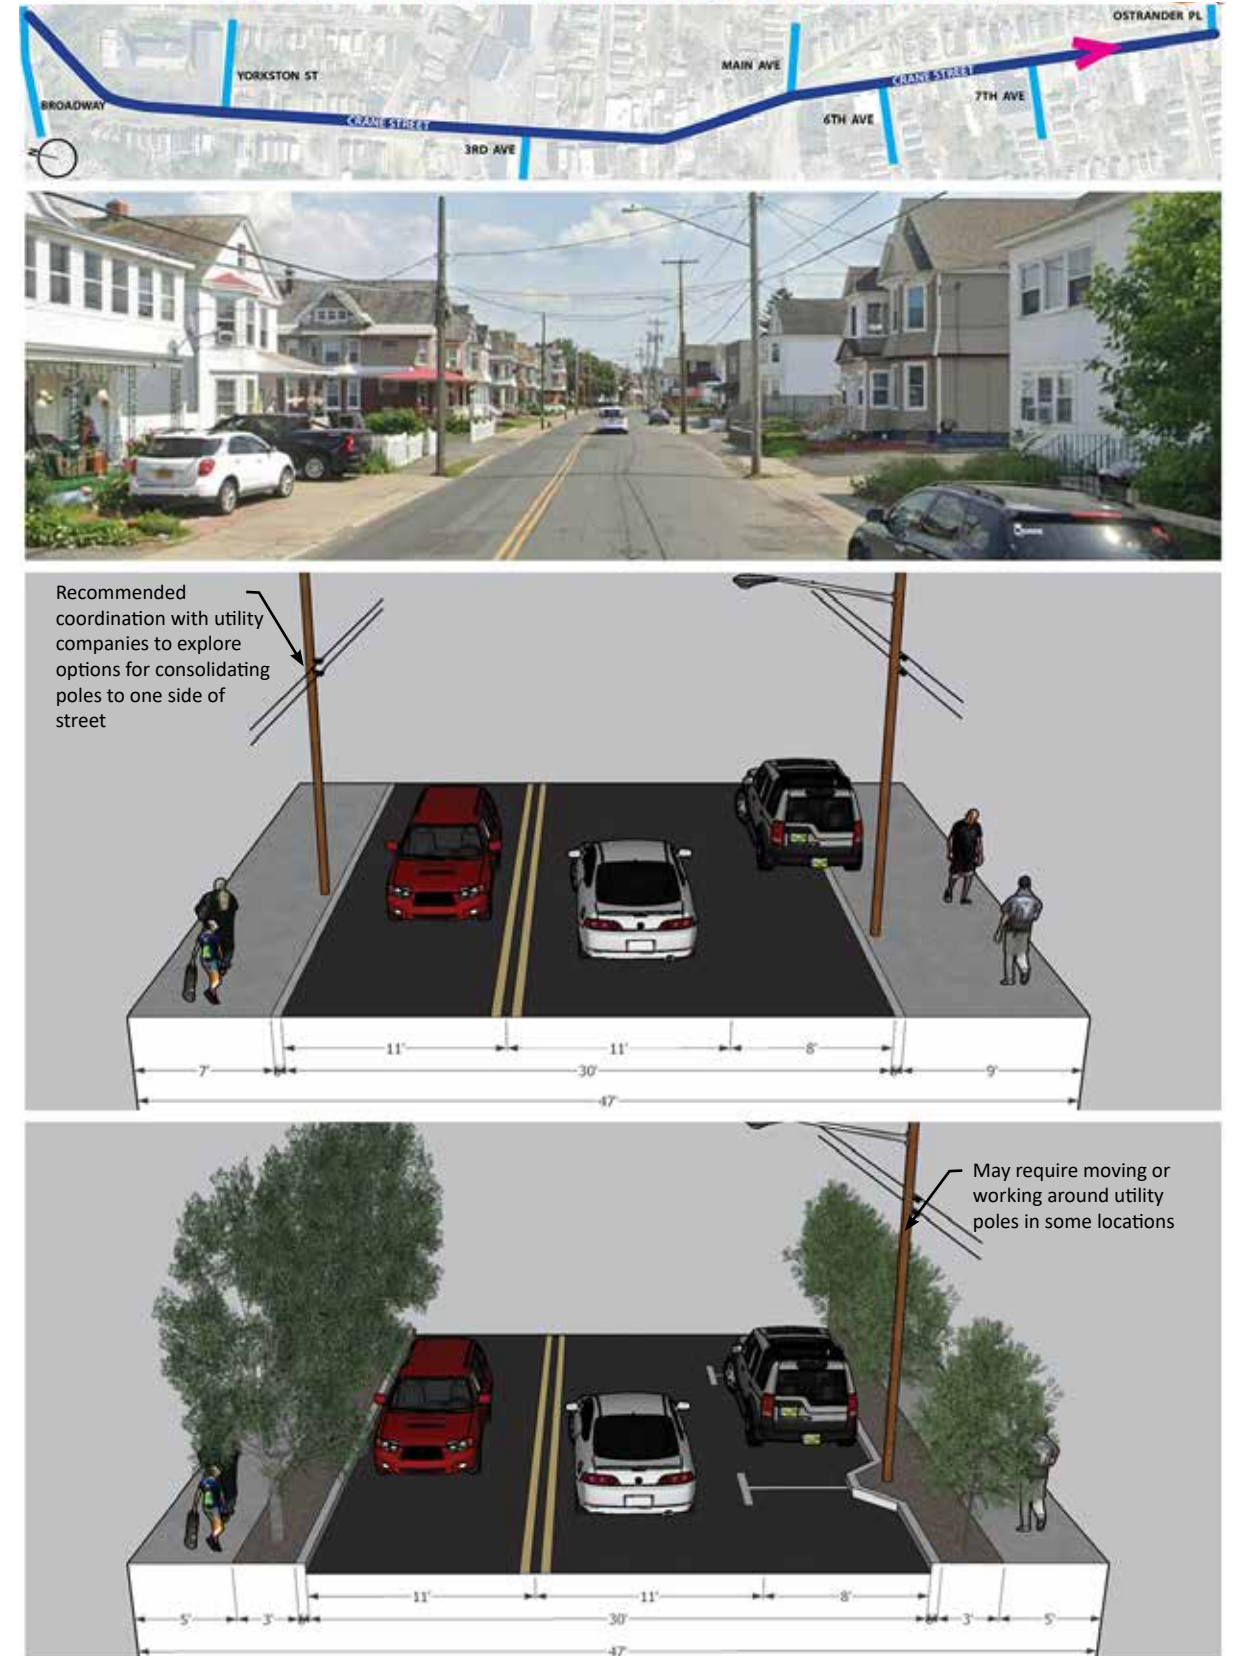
Crane Street : Main Ave to 6th Ave Design Concept Cross-Section
